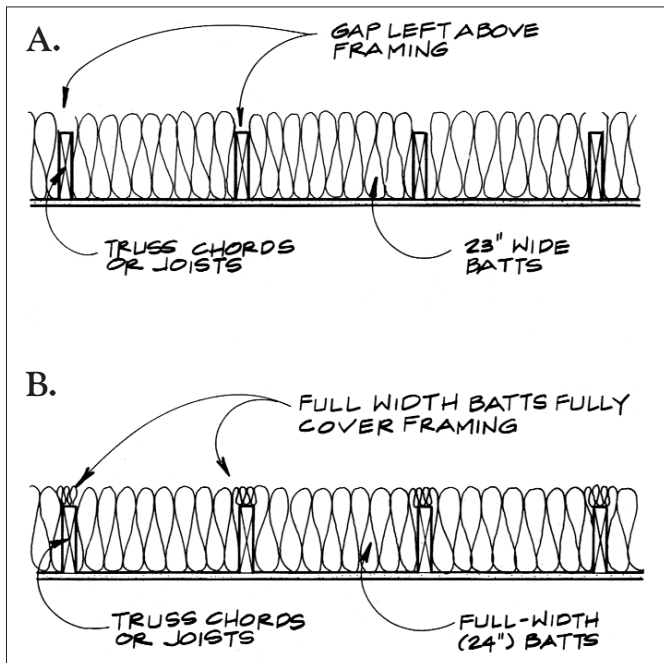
Standard 23-inch batts (A) should not be used in attics because they leave gaps above the framing. Instead, use full 24-inch batts (B), which are made to fully cover the tops of floor joists or truss bottom chords.
